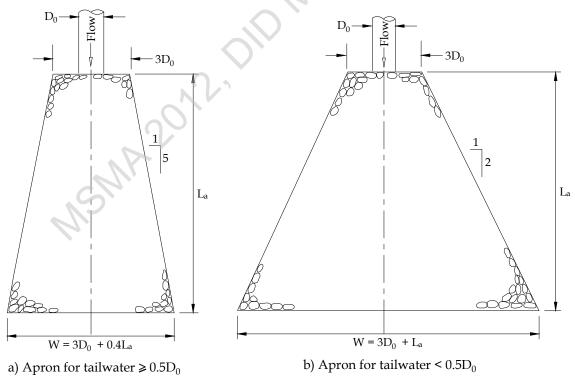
Configuration of Conduit Outlet Protection (U.S. EPA, 1976)
